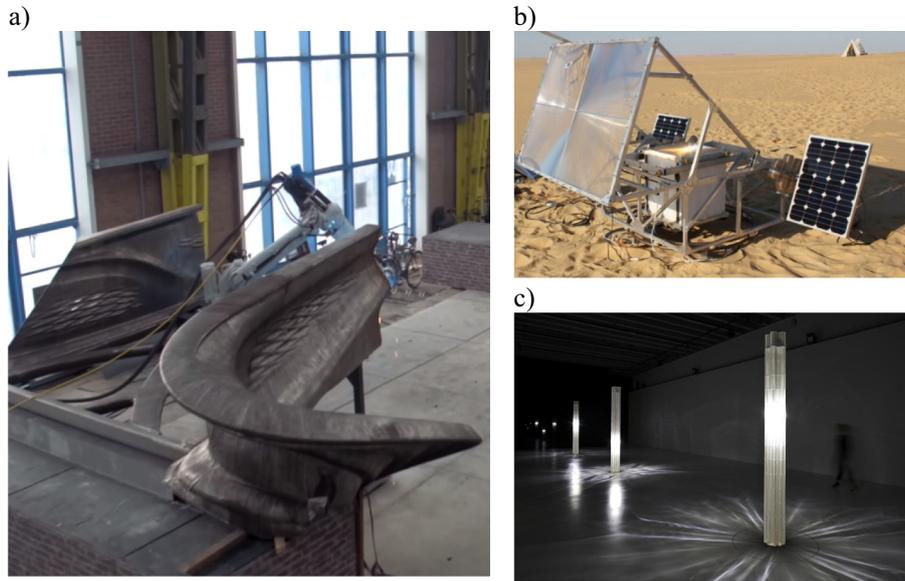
a) Fully functional steel bridge in construction [178], b) Sintering sand [179], c) 3D printed glass columns [180].
